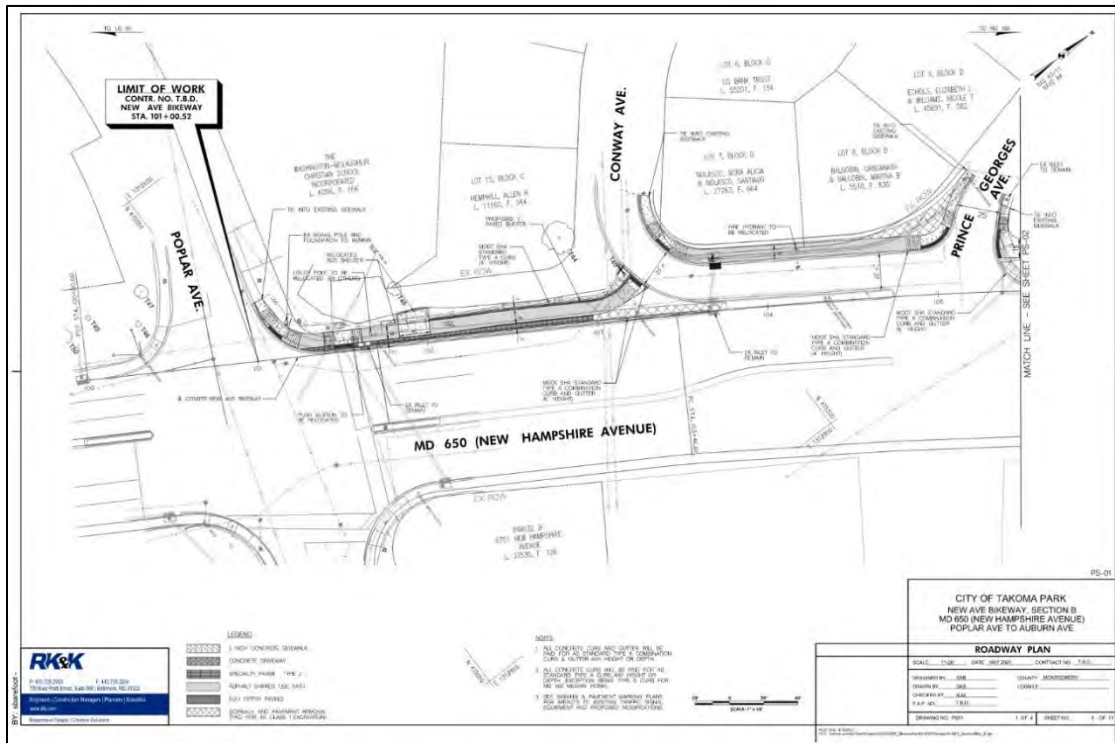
Plan View of Proposed New Avenue Section B Improvements (Part 1)
